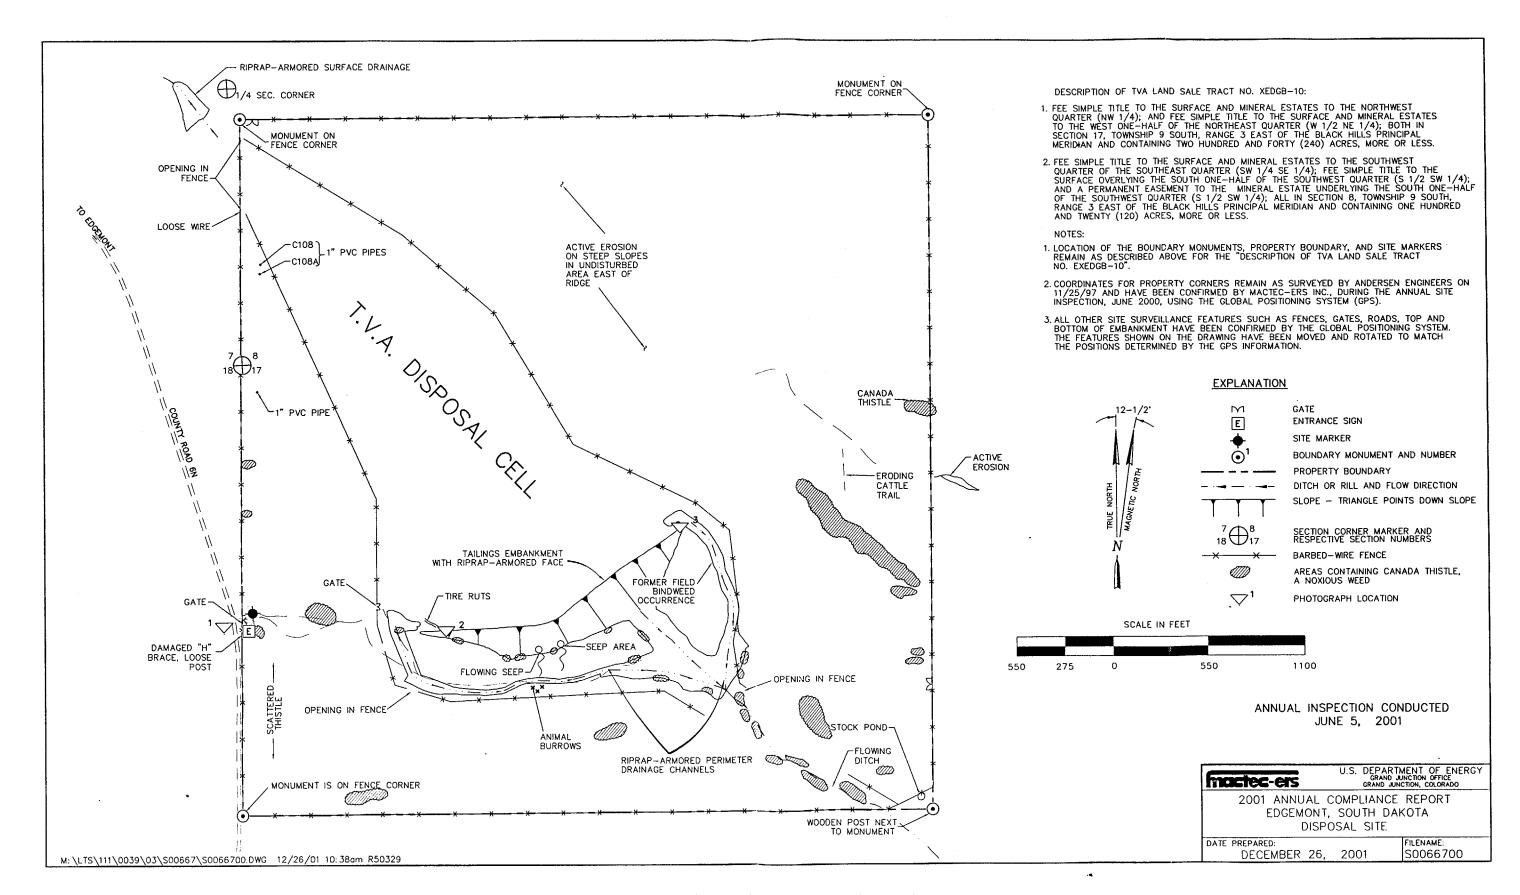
Edgemont, South Dakota, 2001 Inspection Drawing
